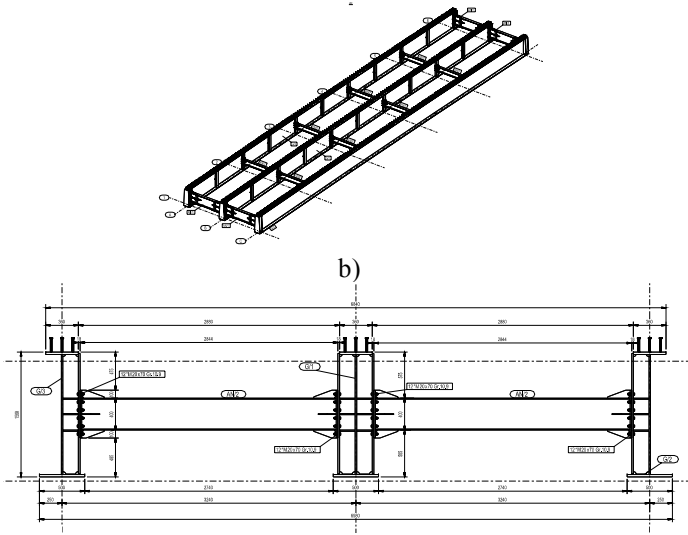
Steel structure of Bocsa-Ramna road bridge: a) Spatial assembly; b) cross-section
